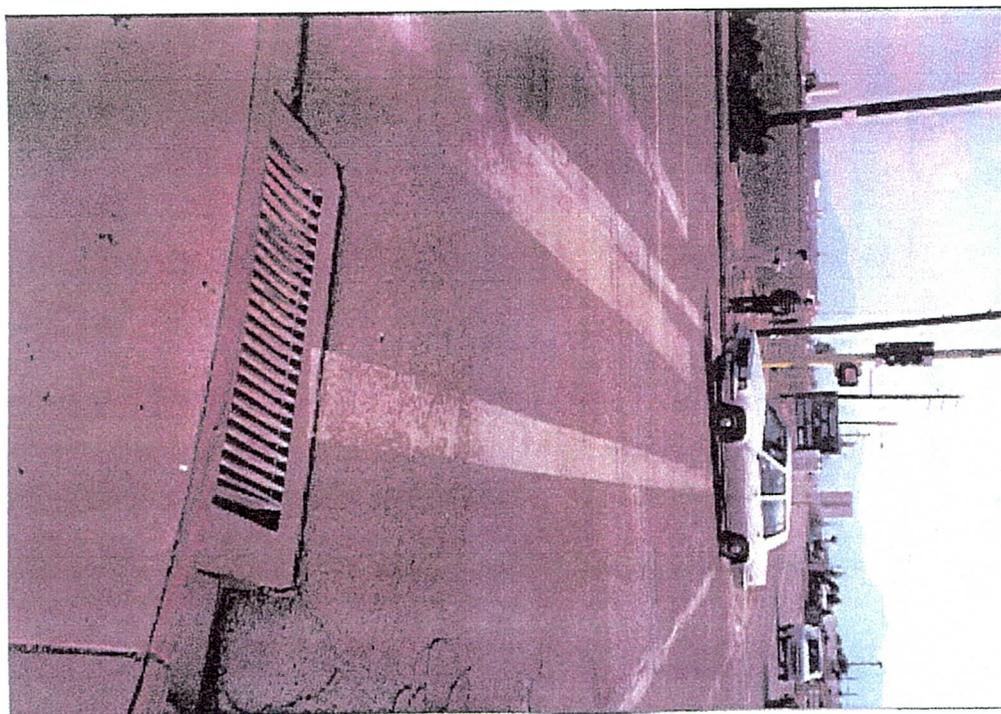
South of Van Buren Street, 91st Avenue has four drive lanes with a center lane. Curb can only be found at the west side of the roadway (looking south).
